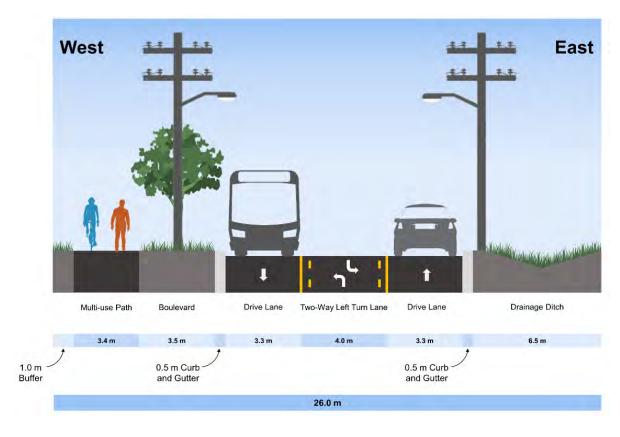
Fifty Road - Highway 8 to Barton Street Recommended Design Concept
